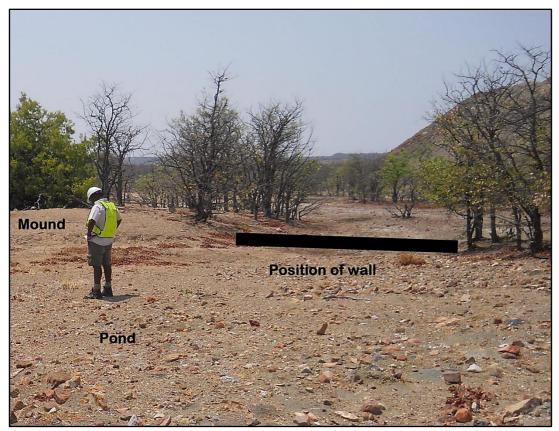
This photo illustrates the position of the retaining wall. Note that the water coarse beyond the proposed position of the wall had eroded to below the depth of the pond area, which will result in the pond draining without the wall. This erosion was also as a result of the flood.
